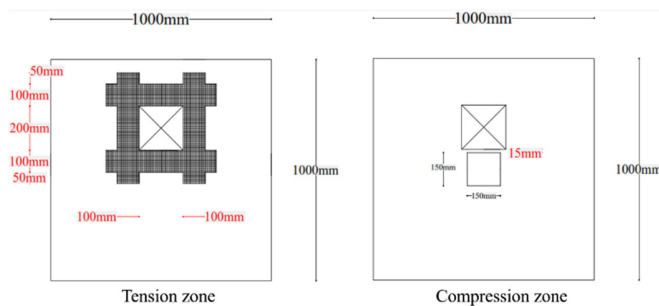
Mold and reinforcement details for a typical slab specimen.
